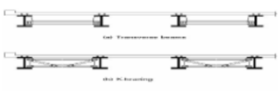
Cross Bracing for Deck Bridges - Intermediate Diaphragms
